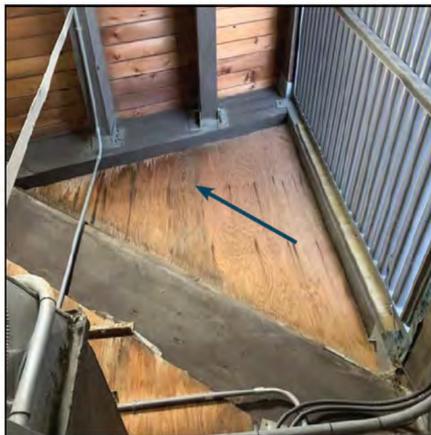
Water Staining, West Wall, Second Level Penthouse Above Fitness Center
